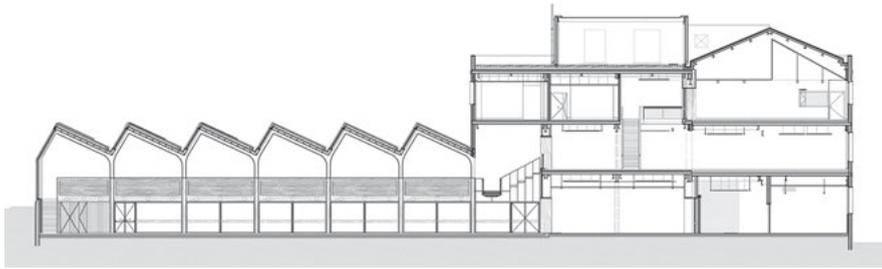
Longitudinal section plan. © Ricard Mercadé Aurora Fernández arquitectes.
